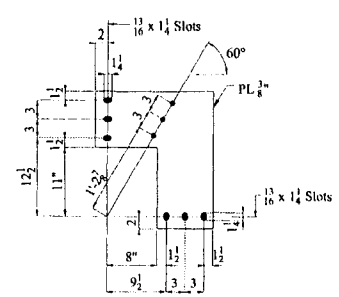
Horizontal brace connection at beam-to-column intersection.
